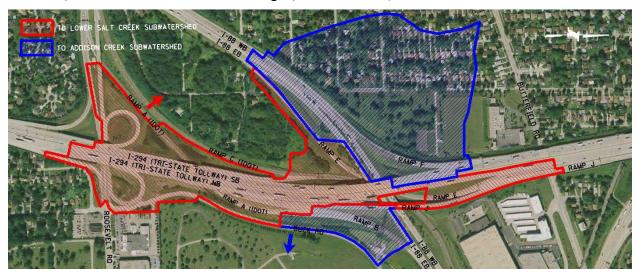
Existing Conditions – Roosevelt Road to north of the I-88 interchange
